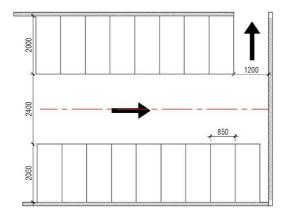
Minimum dimensions for 90° motorbike parking one-way
